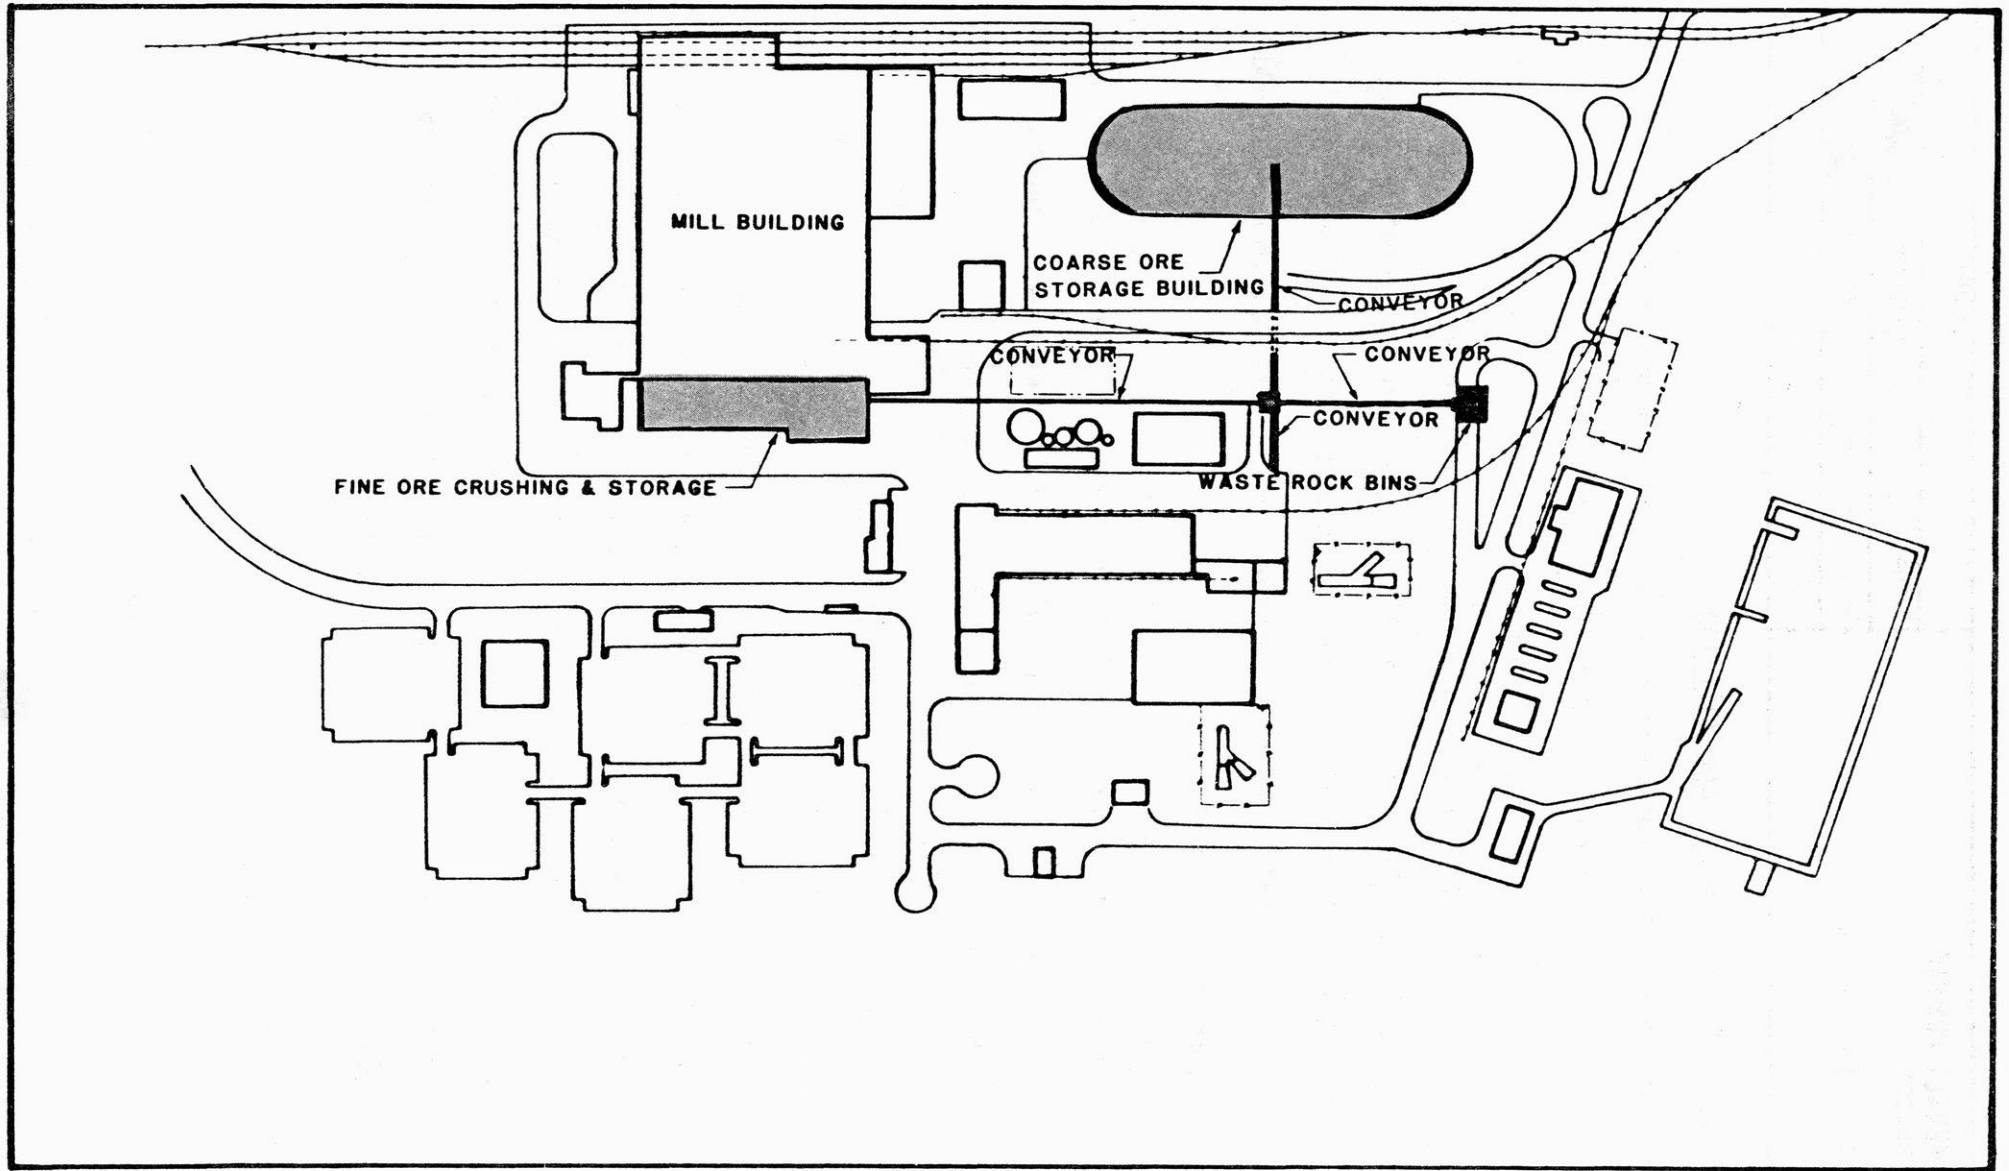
A schematic plan of possible Crandon Mine/Mill Facilities showing the ore handling, storage, and crushing facilities as shaded areas.
